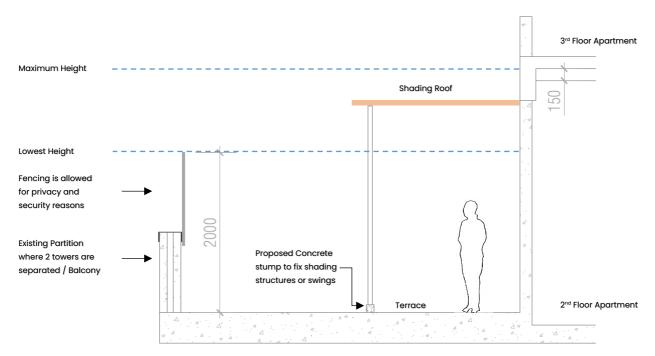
Typical Shading and Fencing requirement diagram for 2nd Floor Apartments
